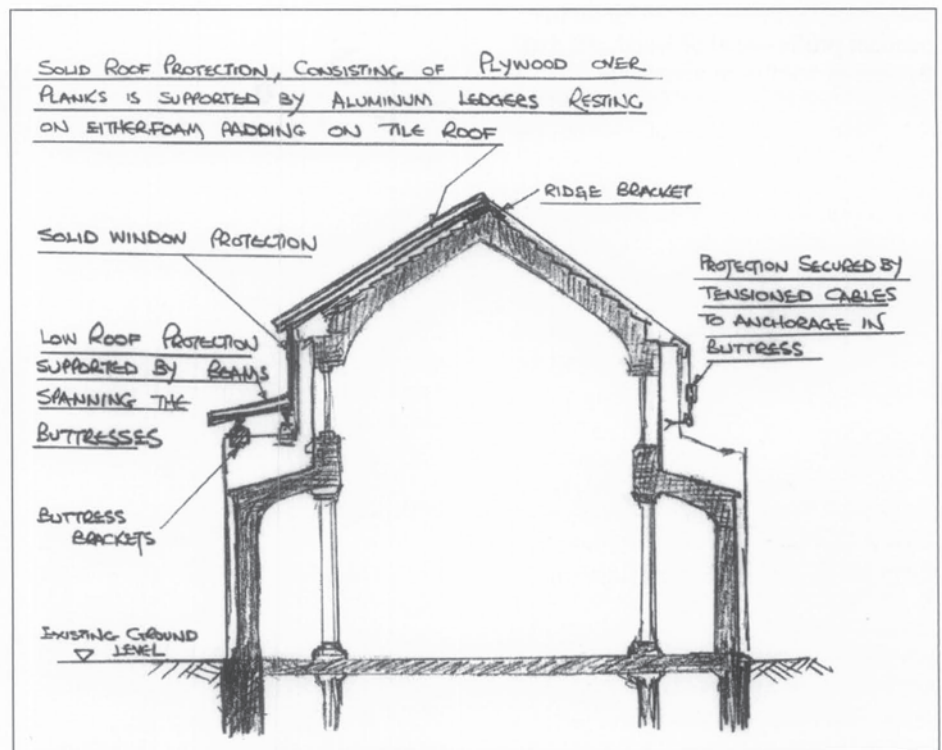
Before new construction was undertaken to the left of this church, a subcontractor was hired to design a protective system for the tile roof and clerestory windows. Drawing: Alan Shalders, Universal Builders Supply, Inc.
